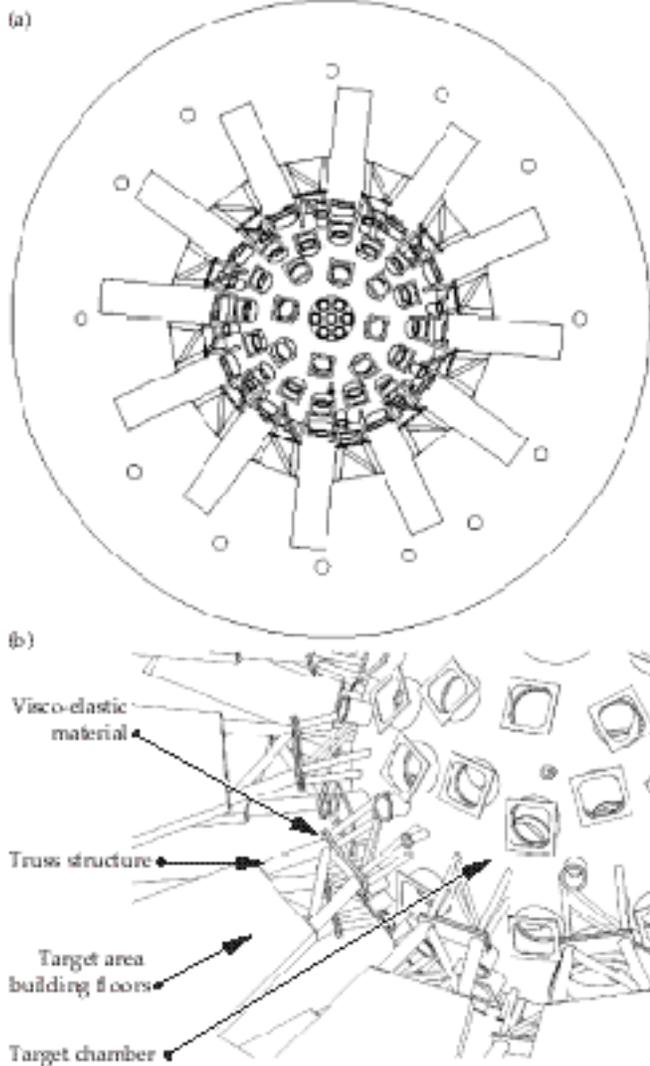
(a) The passive damping structures connect the target area building to the floors of the target chamber, a view from the top of the chamber. (b) Truss structures support a sandwich of steel plates and visco-elastic material. (40-00-1097-2290pb01)
